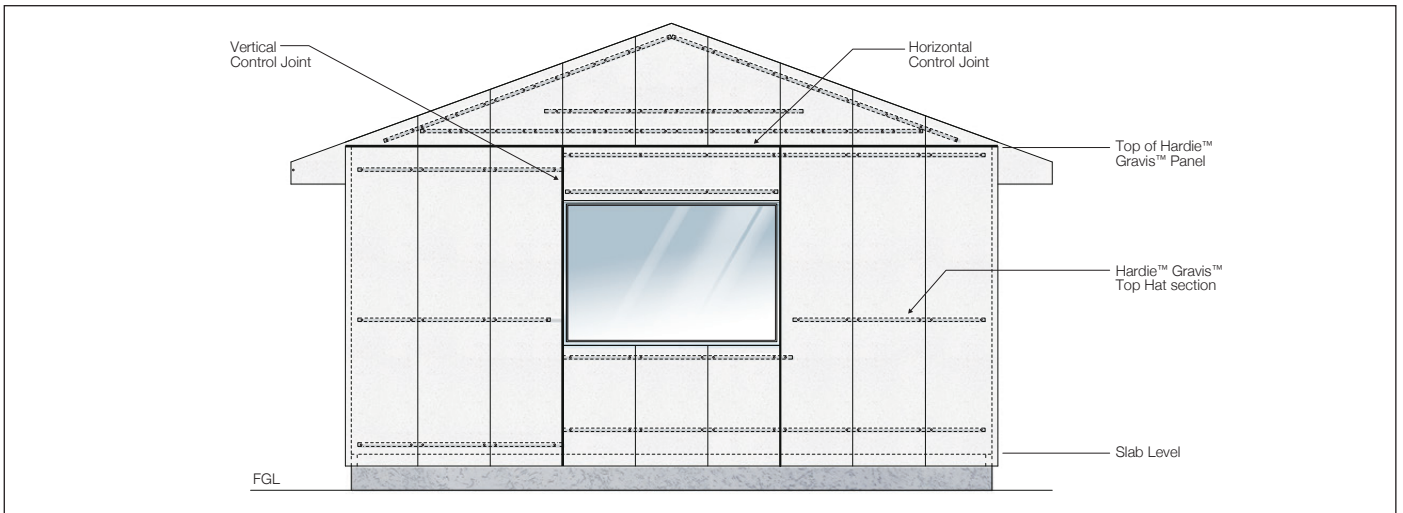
SINGLE STOREY LAYOUT - GABLE ROOF ELEVATION
